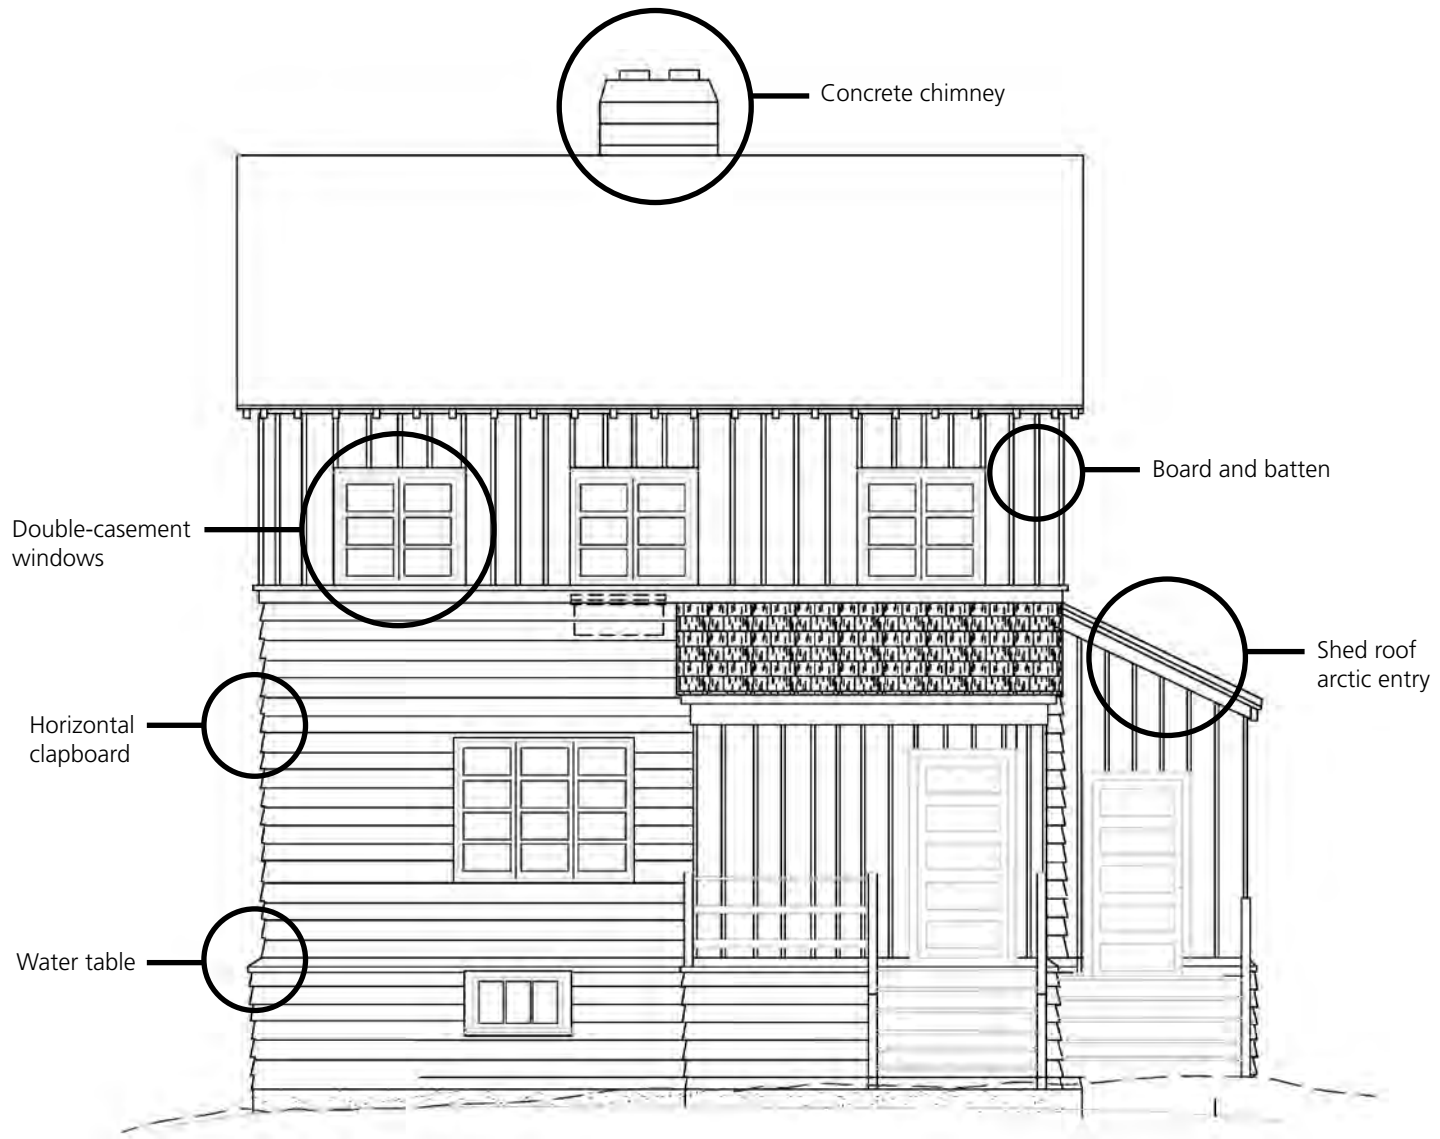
Building 12, East Elevation, 2012 (NPS Alaska Regional Office files)
